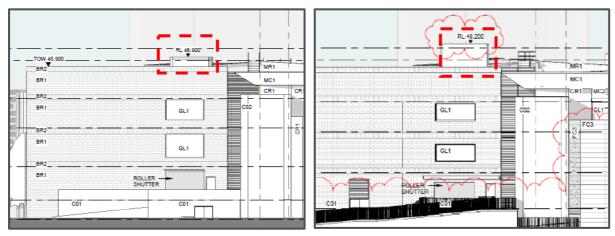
| Lift overrun height (western elevation): approved plan (left) and proposed modification (right) (source: Applicant)
